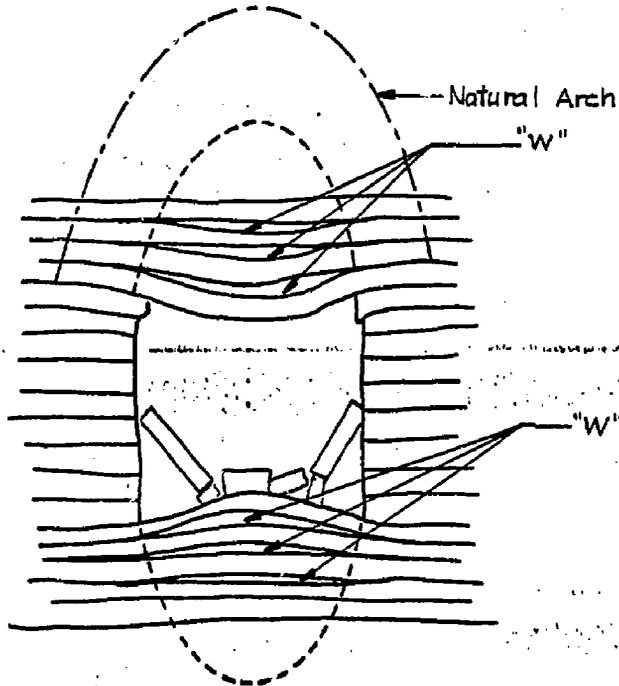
Weber's Cavities "W" in the Roof and Floor.
